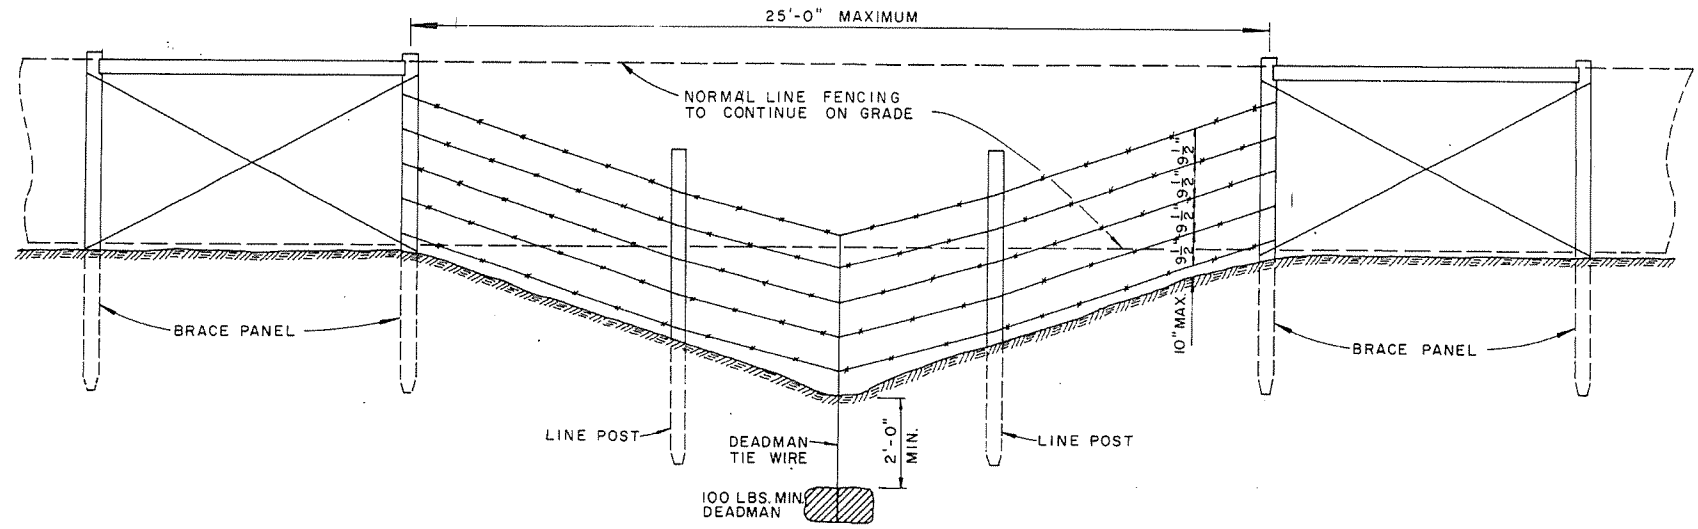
DETAIL OF FENCE CONSTRUCTION AT LARGE CULVERTS (5' IN HEIGHT AND OVER)
